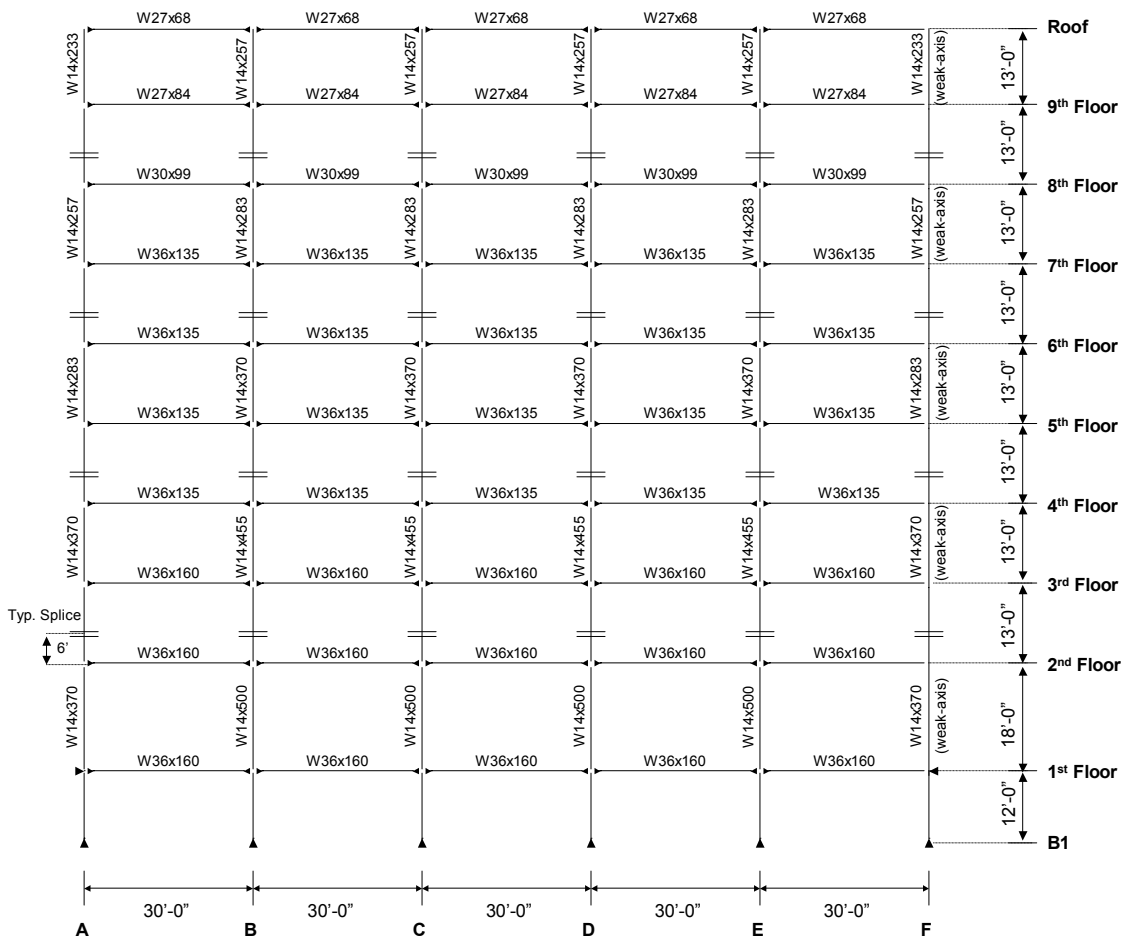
LA 9-Story MRF (N-S Elevation)
